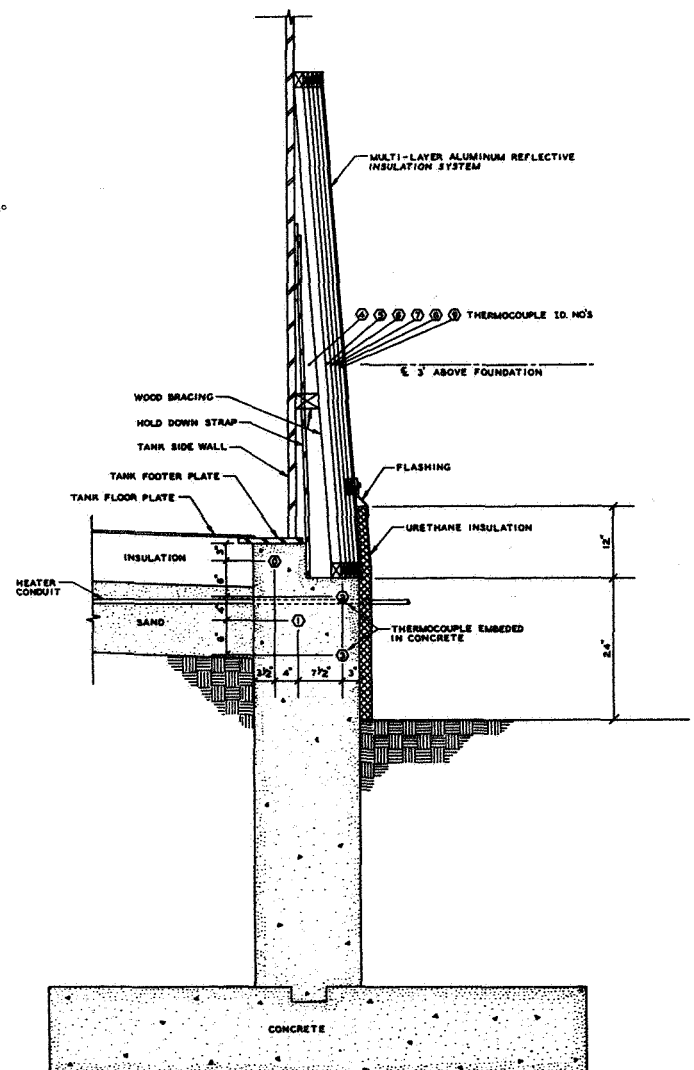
Section, showing concrete foundation, tank construction, insulation system, and thermocouple locations.
